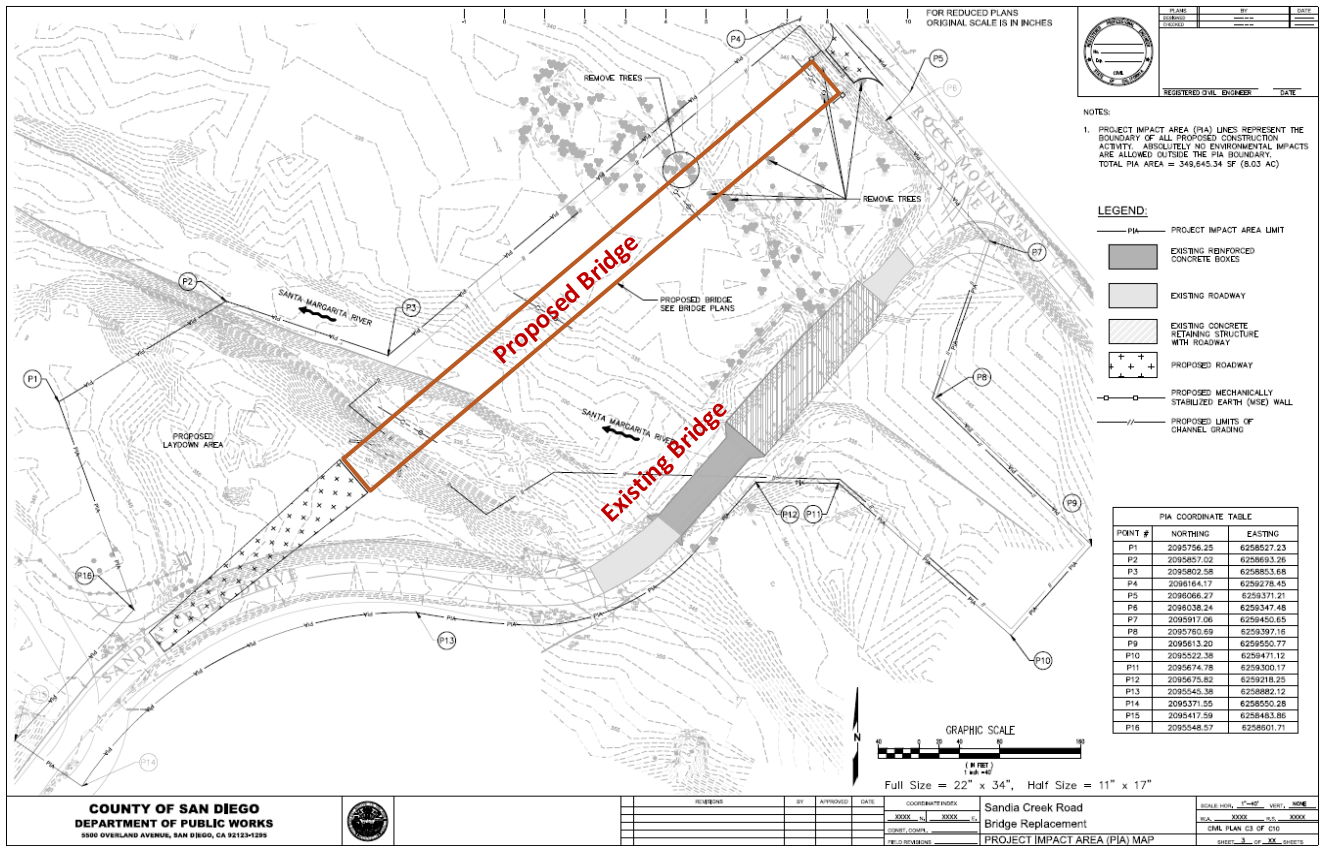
Existing and Proposed Bridges – Sandia Creek Drive Crossing over Santa Margarita River
